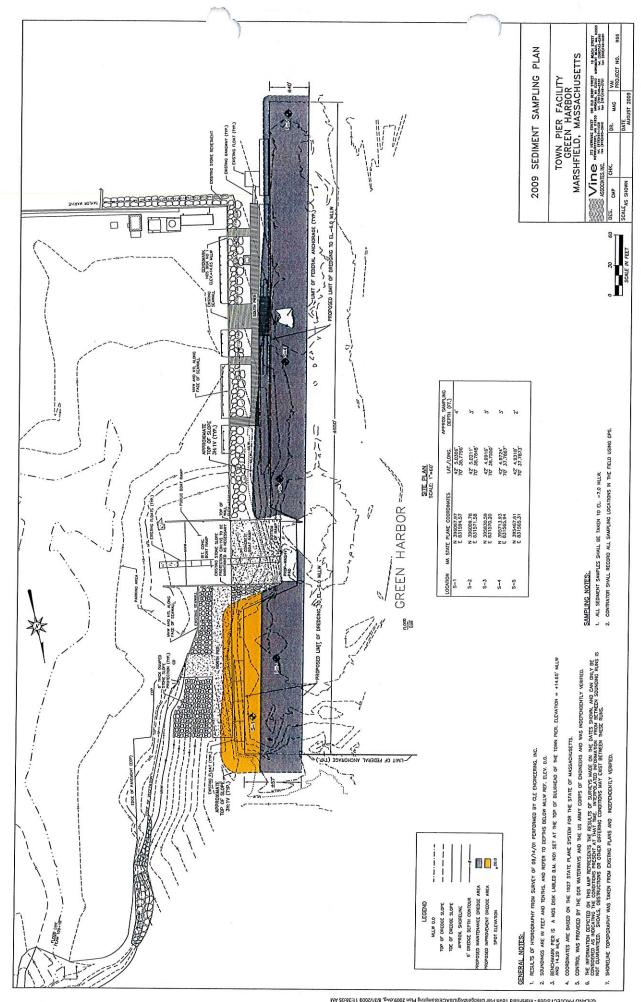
Existing Town Anchorage Basin Area (not to scale)
